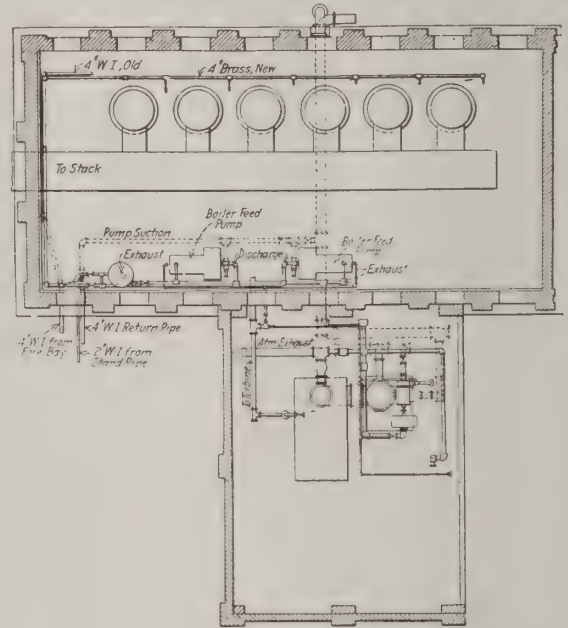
PLAN OF PLANT OF SALMON FALLS MFG. CO.
